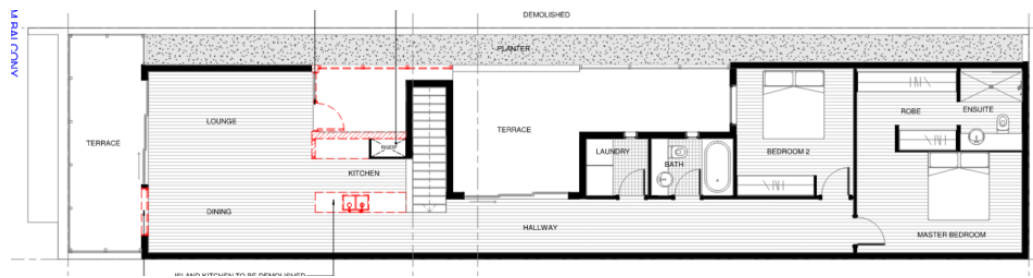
Approved demolition level 2 plan under DA/660/2003/C - 7/274 Arden Street, Coogee (Source: Place Studio)
